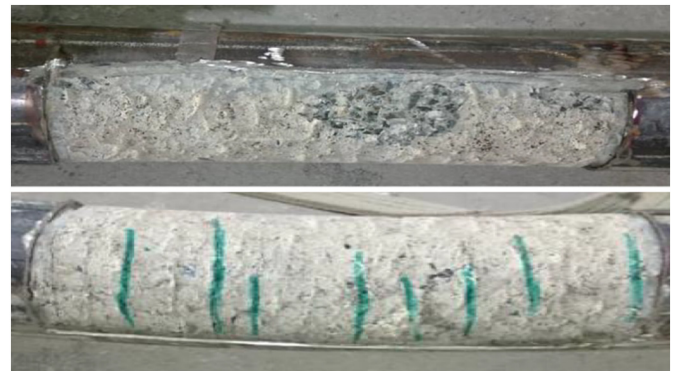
Failure mode of concrete infill at the compression and tension sides.
